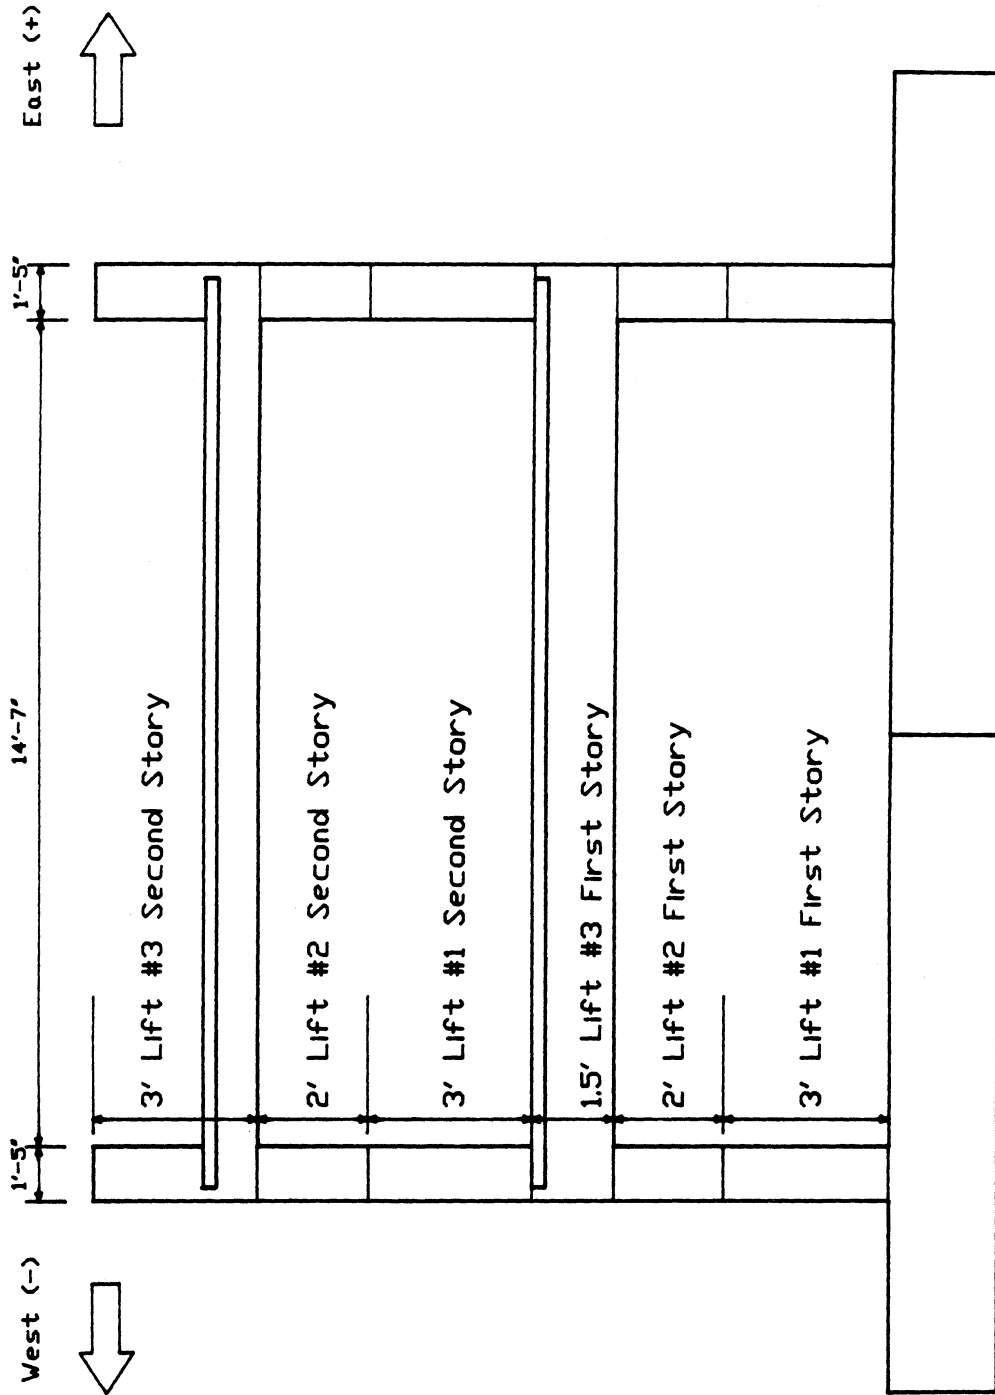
Lift Sequence for The Reinforced Concrete Jacket
